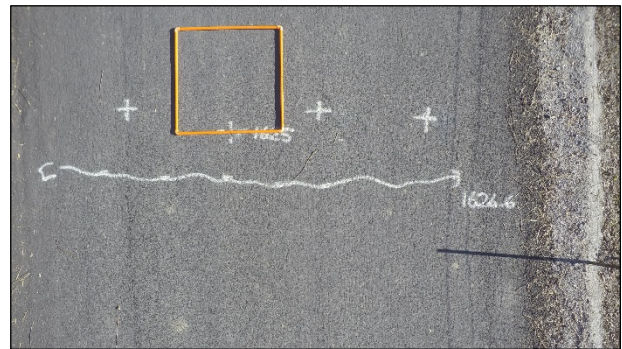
Aerial photograph of crack with 1 m×1 m scale.
